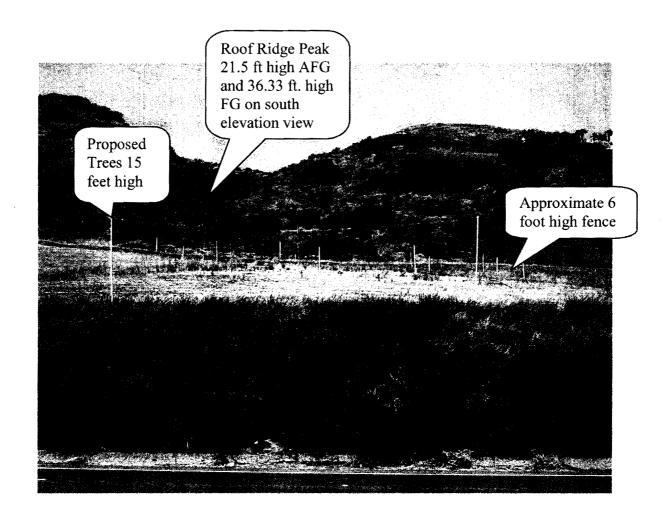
Application No. 4-01-117 Knapp Short Range View from Pacific Coast Highway on highway shoulder about 350 feet south of project site. • .
